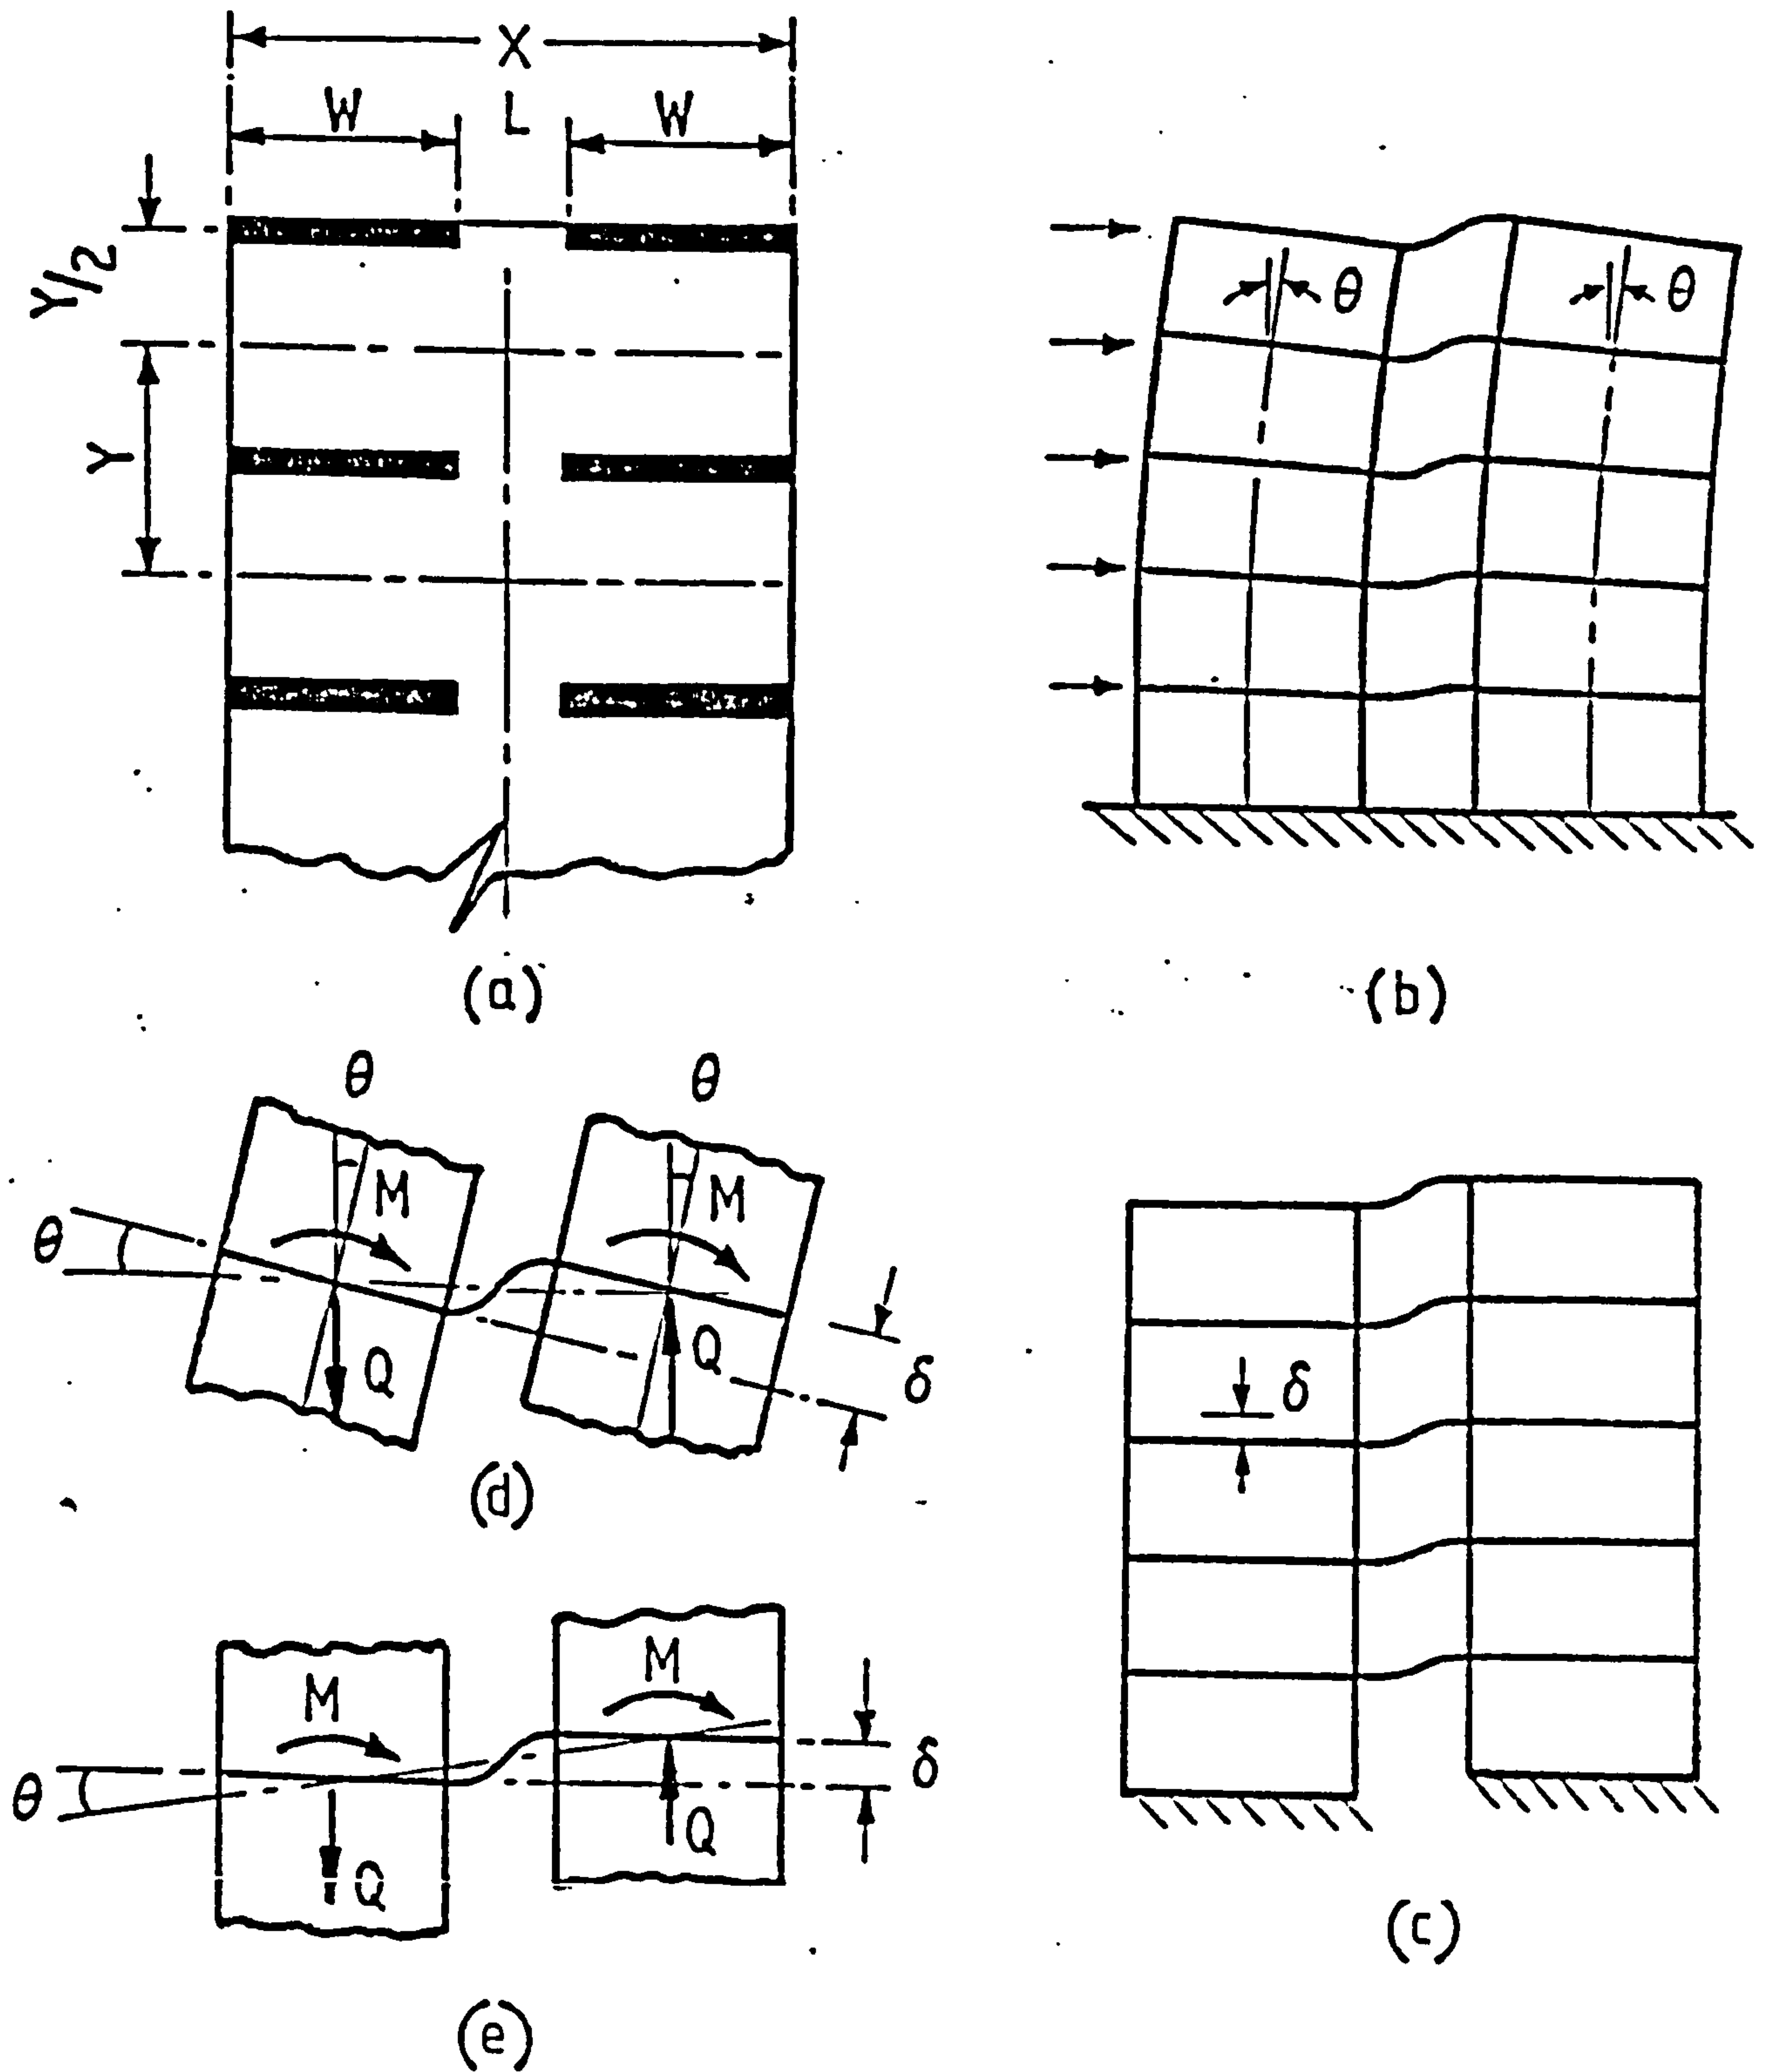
Structural Actions of Coupled Shear Wall-Slab Structure
